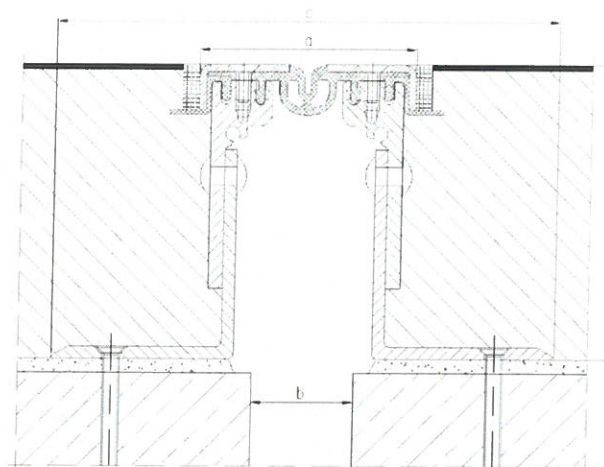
CONECTO PARK GA 43.10.100+200 S waterproof expansion joint profile
